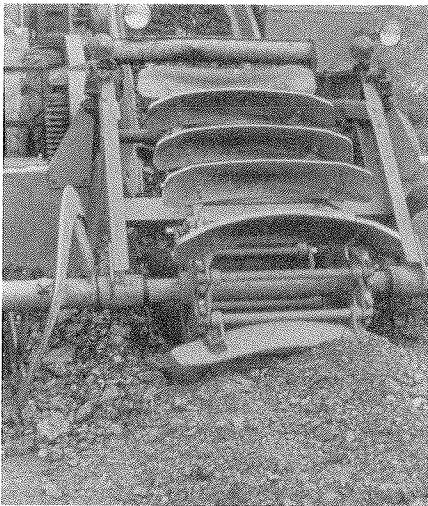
Recycled asphalt pavement being picked up from the windrow on the Chester County project.
